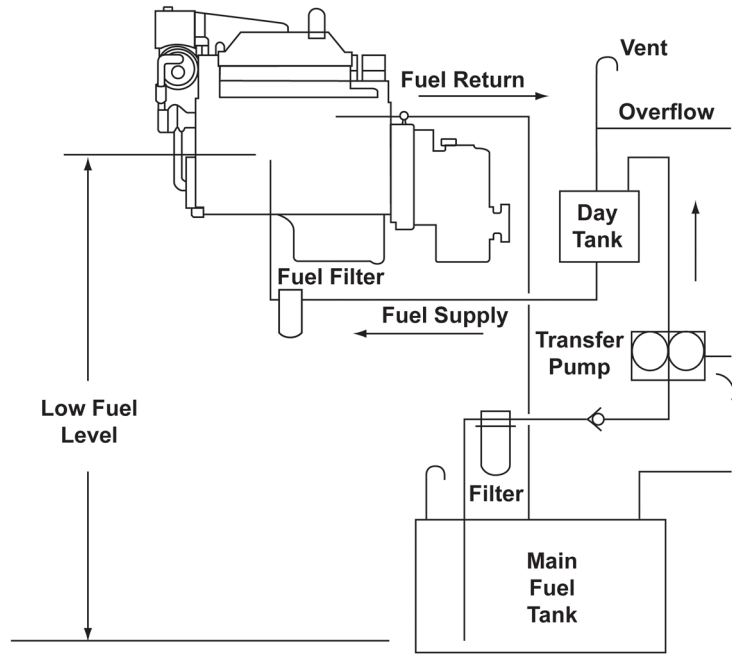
Example schematic of fuel system with tank below engine inlet
